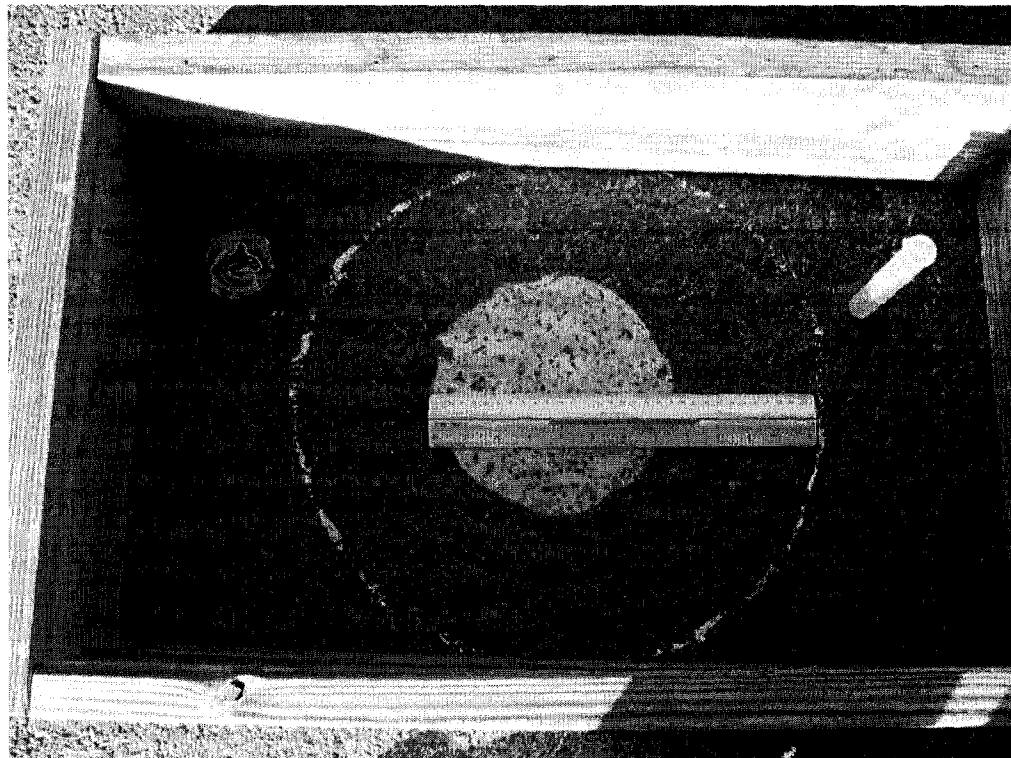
Sand Patch Test (Per ASTM E 965, 2001)
